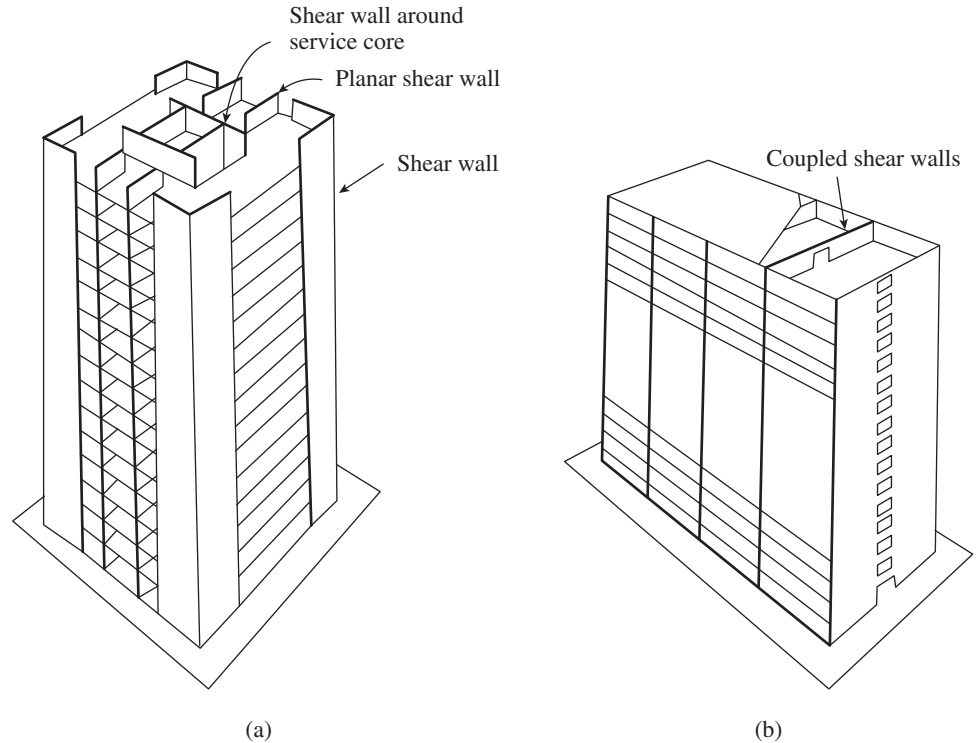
Types of shear walls (a) Solid shear walls (b) Coupled shear walls
